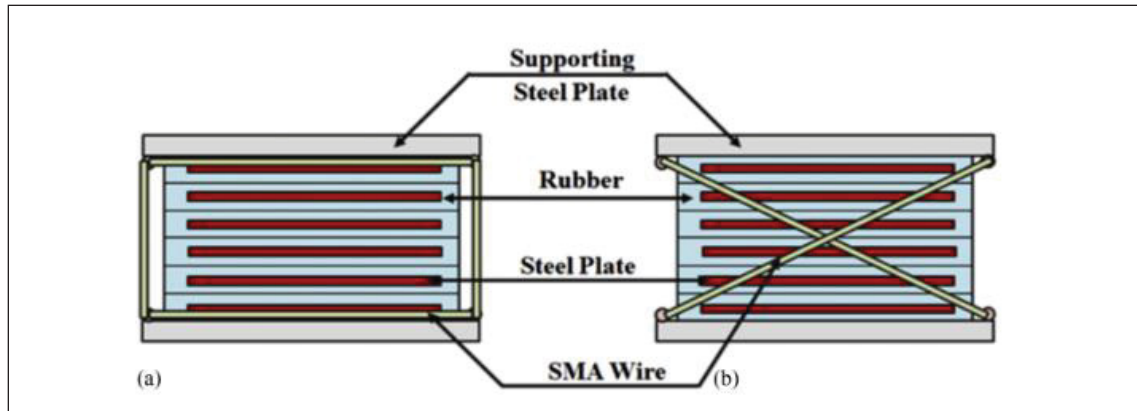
Rubber bearing with shape memory brace: (a) front view; (b) side view
